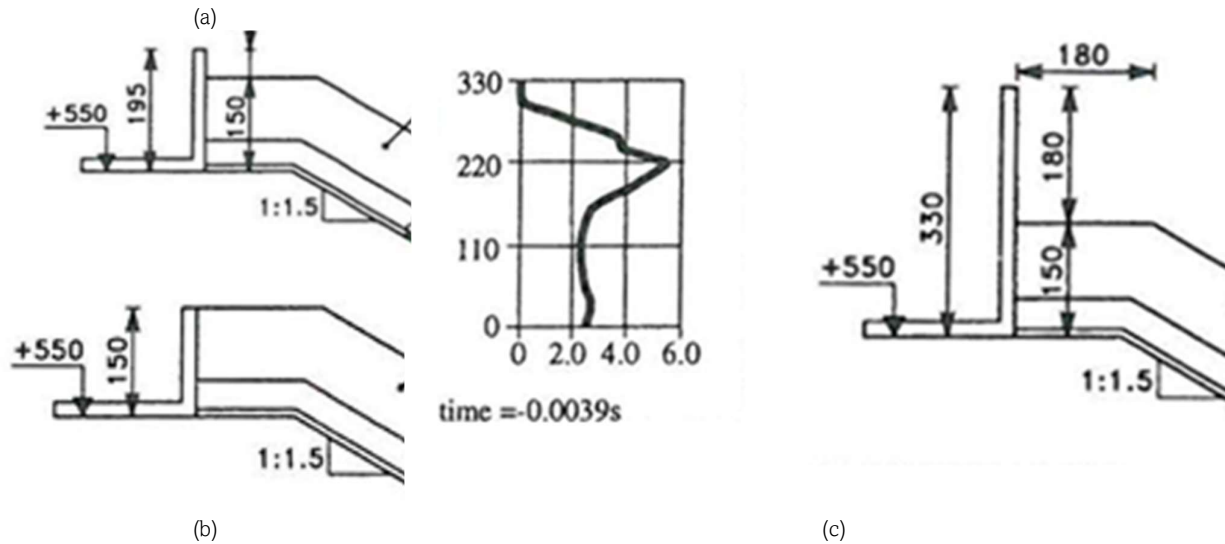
Testing sections of breakwaters with crest walls in physical model tests. (a): Crest wall mostly sheltered by the armour layer. (b) Fully sheltered crest wall by the armour. (c) Partly exposed crest wall (with protruding element). Pedersen (1996).
